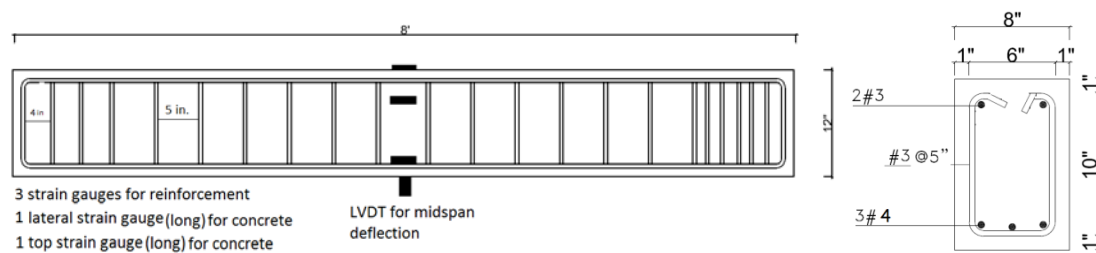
Reinforcement layout and locations of strain gauges for test beams.
